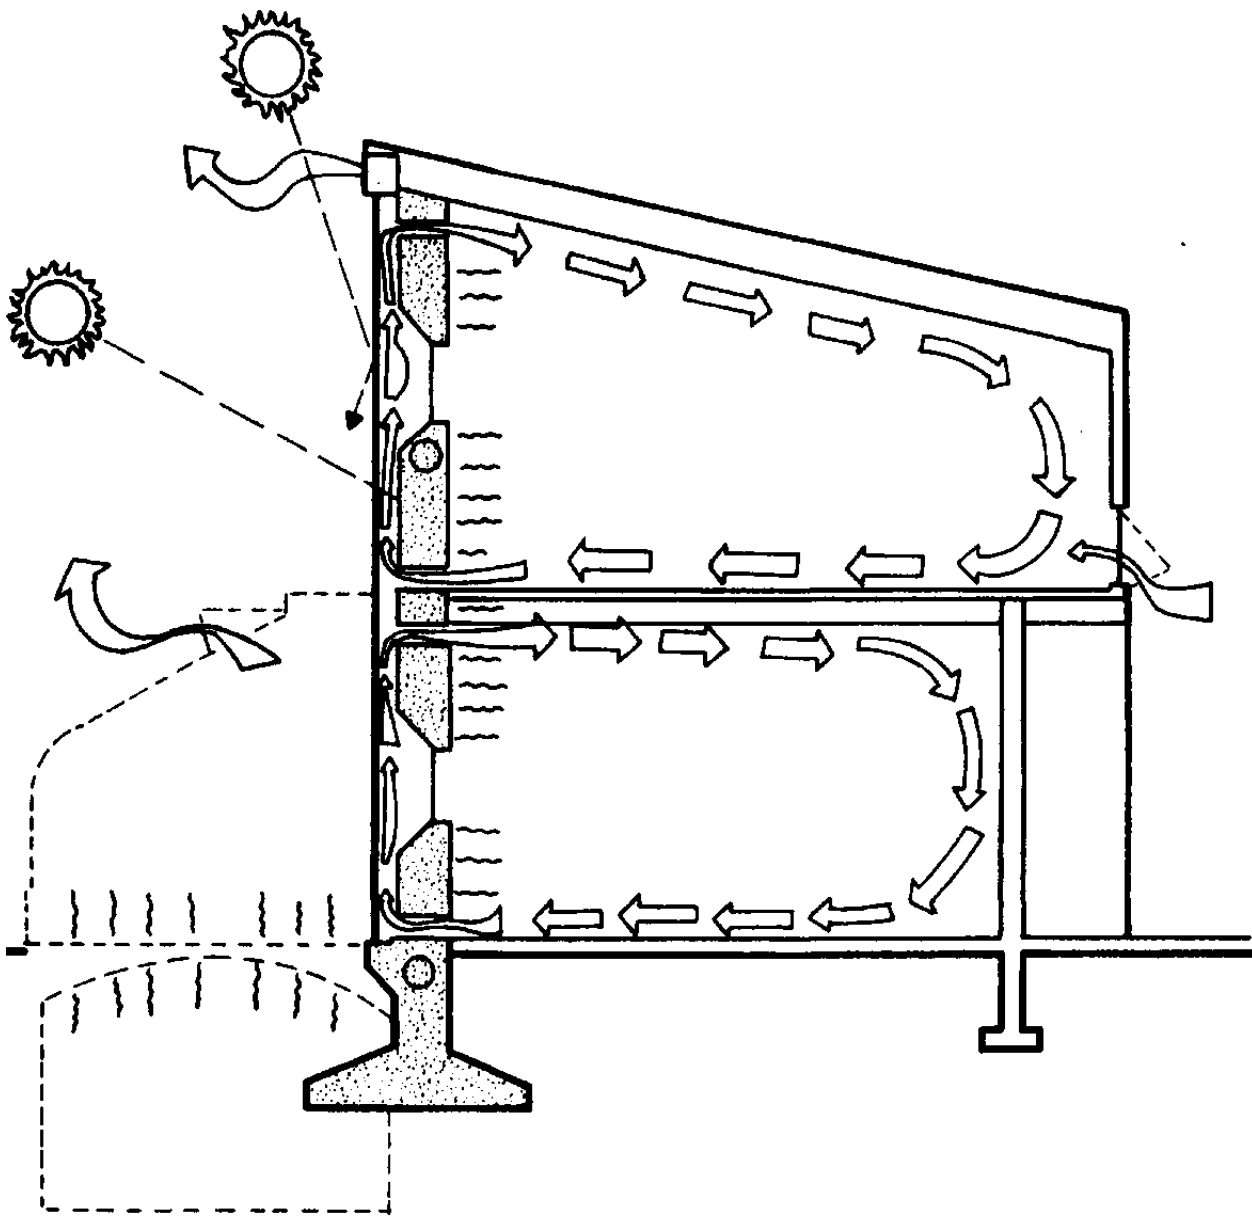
A cross-section of the Kelbaugh house showing heat flows (SAN).
